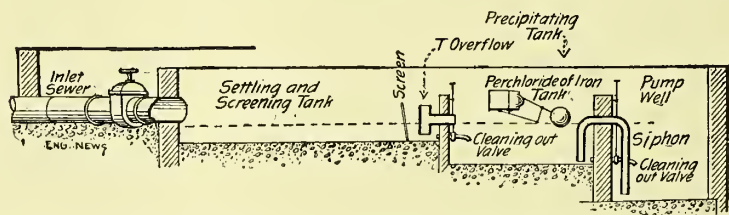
LONGITUDINAL SECTION THROUGH TANKS AND PUMP WELL.
